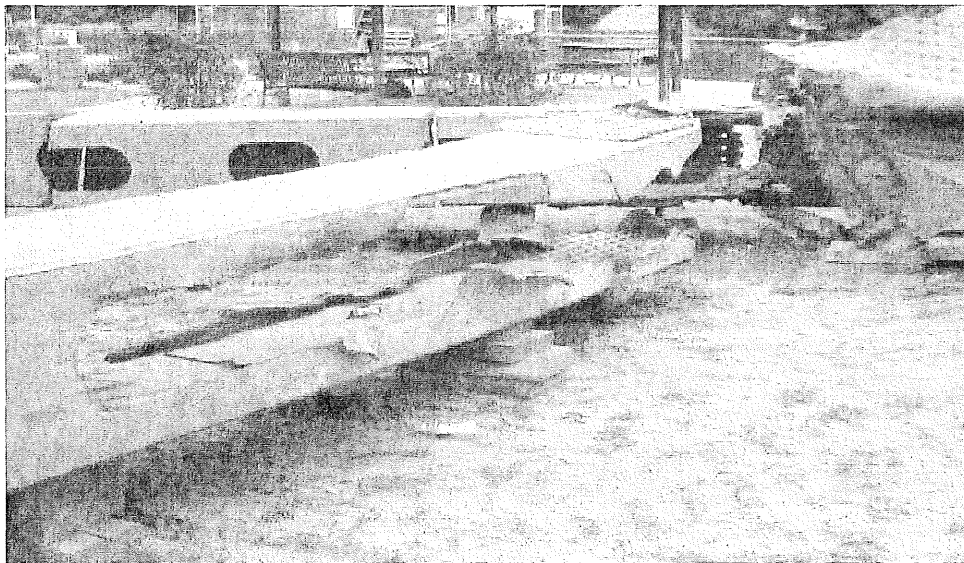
Splitting of cover plates at U10 end of Diagonal L9-U10W, east elevation facing up.
